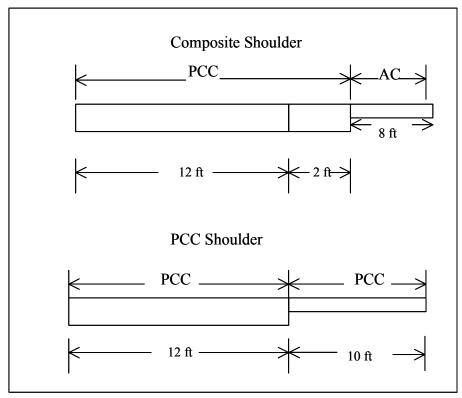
Pavement-Shoulder Cross Sections for LCCA
